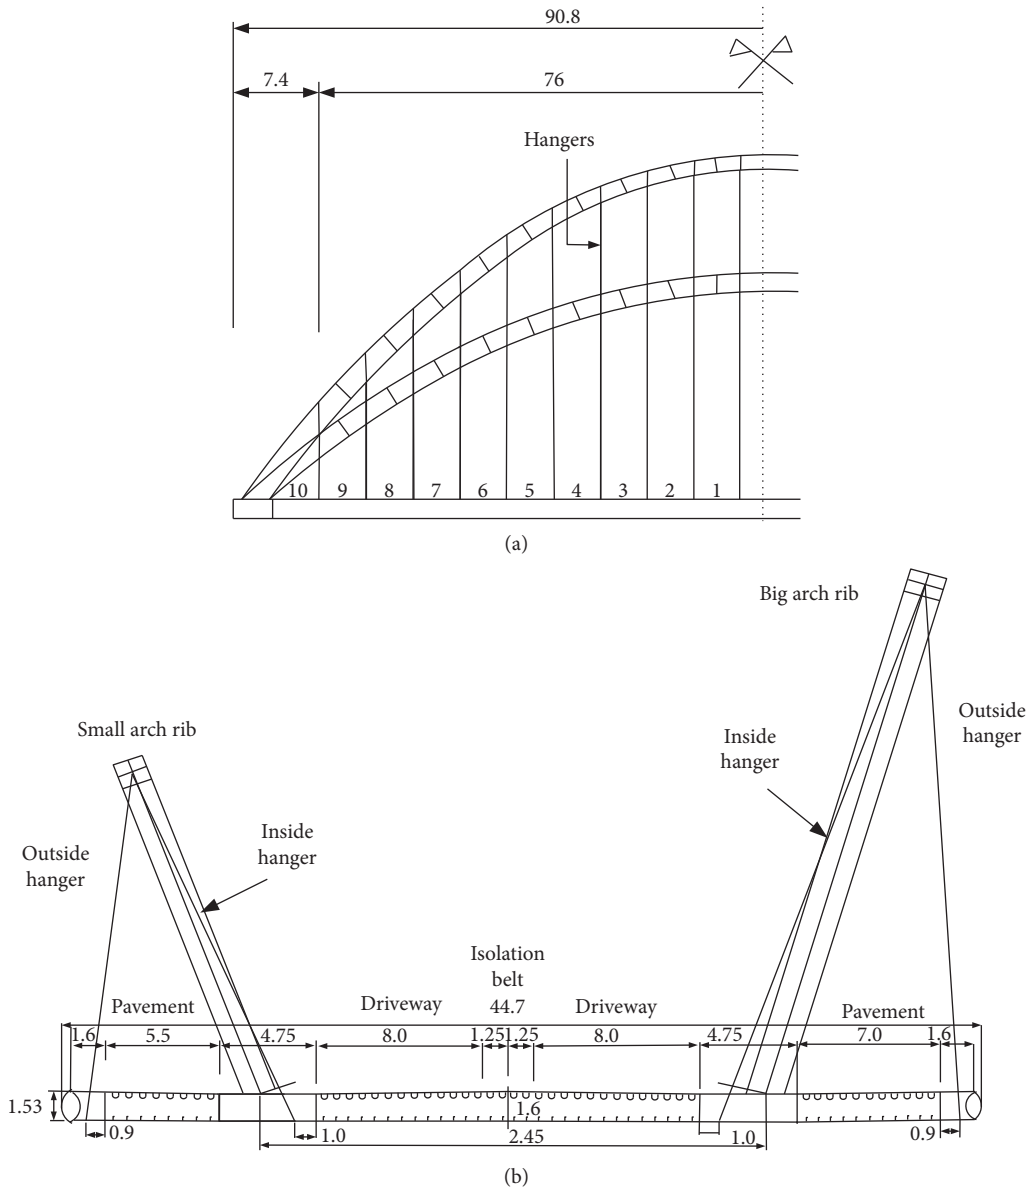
Details of the investigated bridge [38]. (a) Elevation. (b) Deck cross section at the center span.
